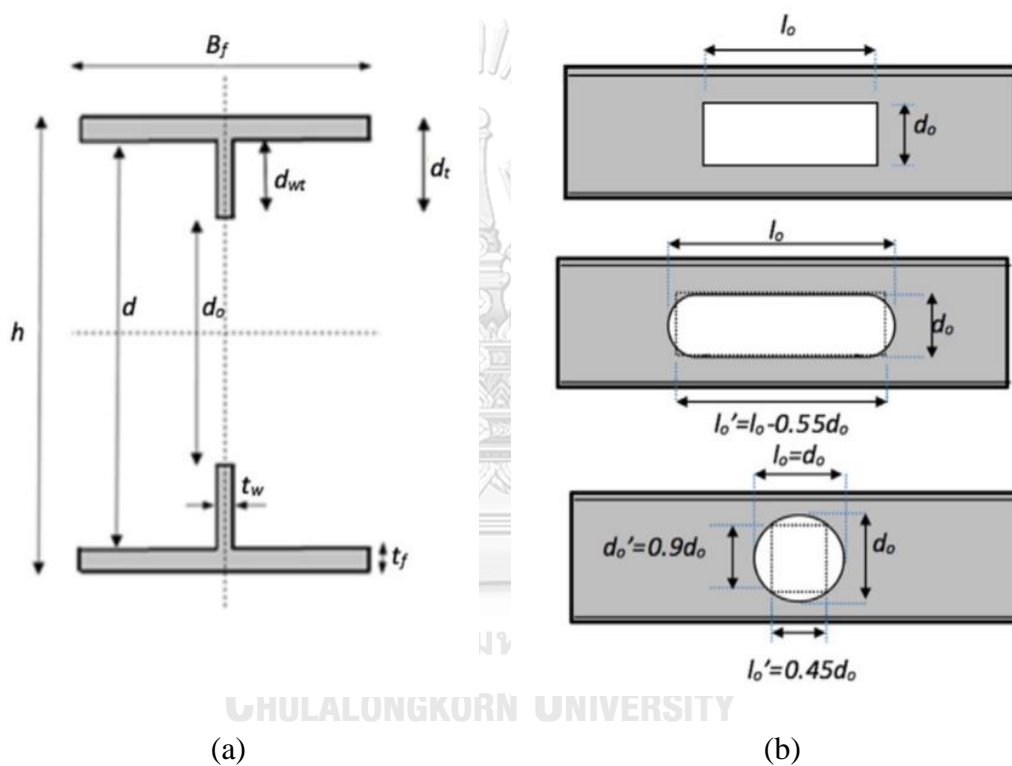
Tee-section, rectangular opening, elongated circular opening and circular opening (Najafi and Wang, 2017).
